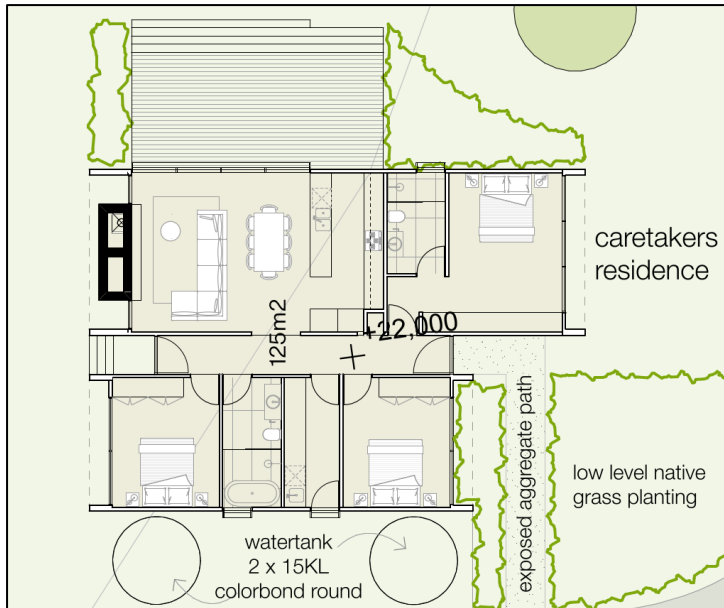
Floor plan of caretakers dwelling. Source: Application documents.
